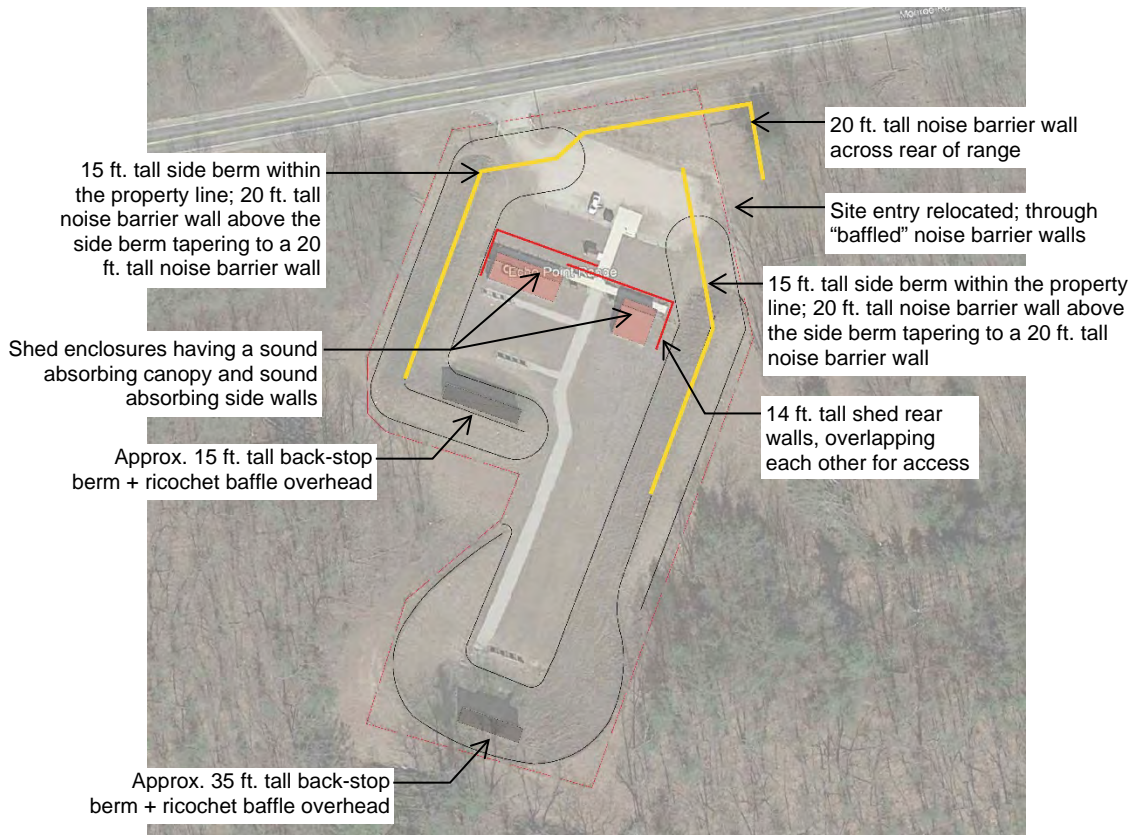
Concept plan diagram of the base range with the site entry relocated to the northeast corner of the site; 20 ft. tall rear walls across the range; 20 ft. tall noise barrier walls above the side berms; and 14 ft. tall noise barriers behind the sheds | Model H
